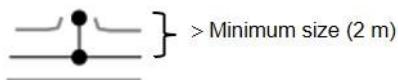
The minimum size for a Road Element from junction to junction is 2 metres.
